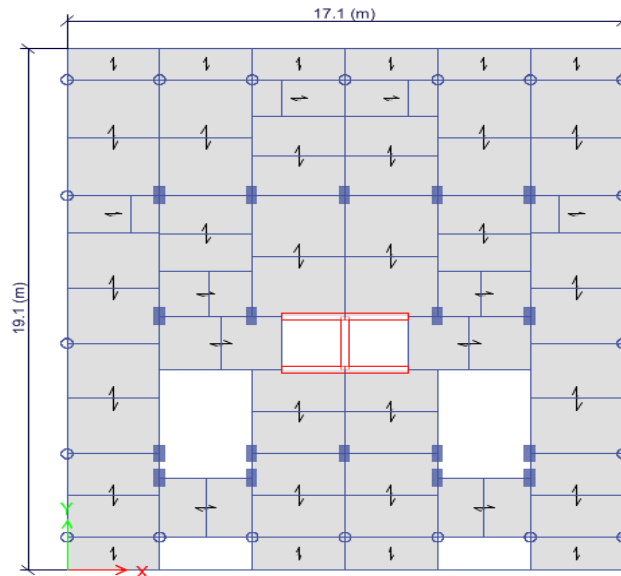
Plan View of Building with peripheral CFST columns (M3-PCC)
